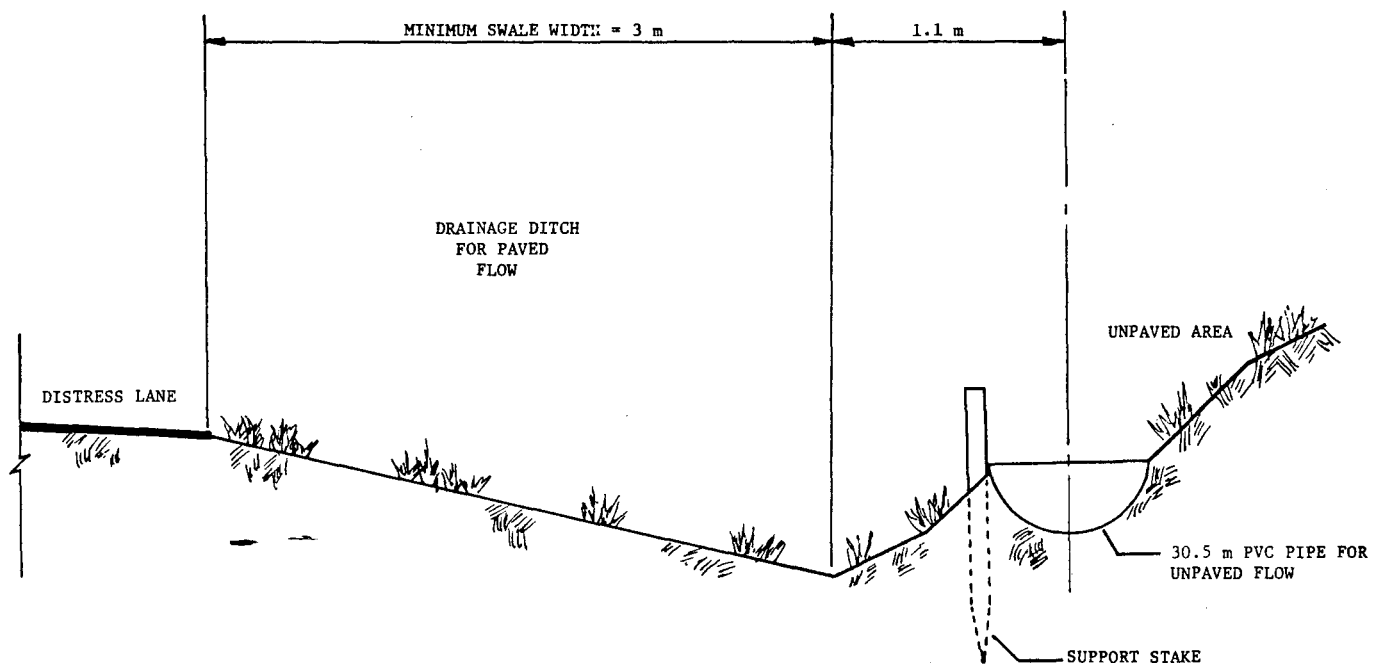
Drainage scheme cross section - Harrisburg I-81 site.
